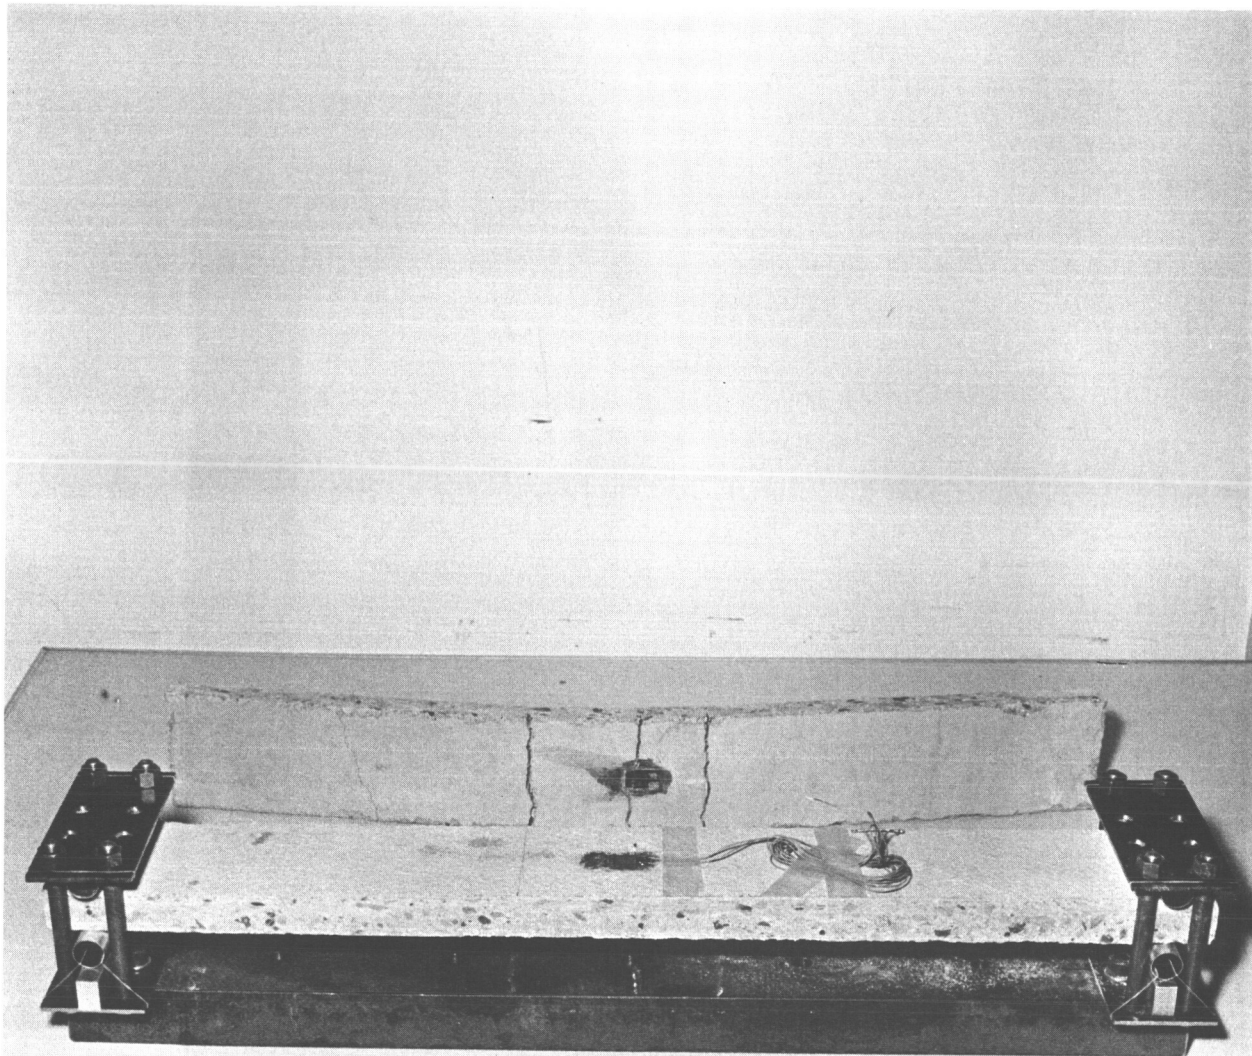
Concrete Beam Showing Supports in Detail and Typical Failure Mode of a Test Beam.
